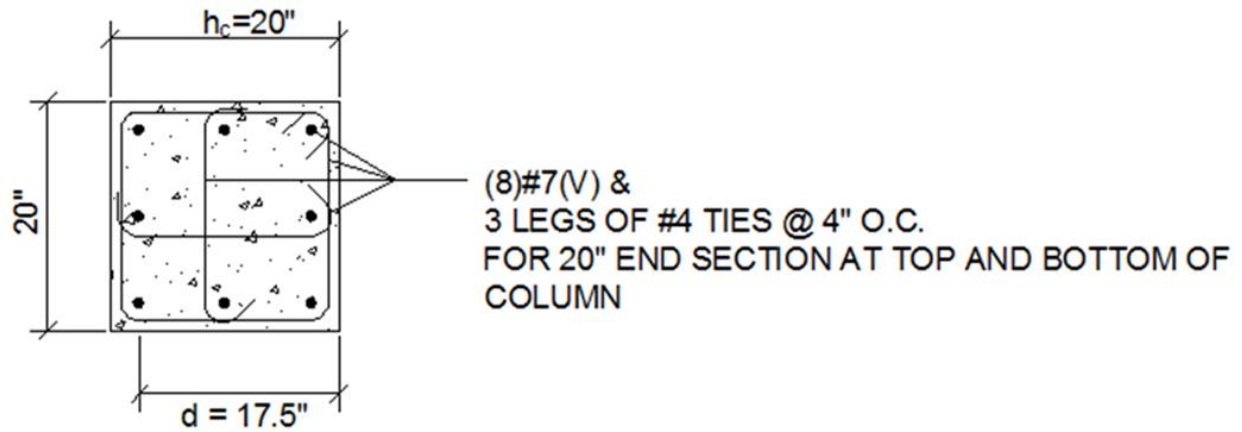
Exterior column cross-section at end of column at all floor levels based on SDC D design
